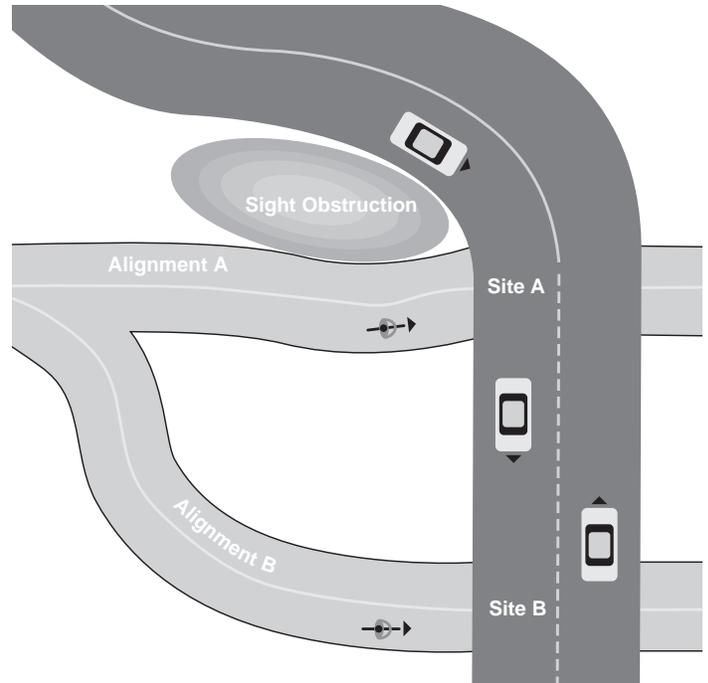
Proper path alignment can help eliminate sight obstructions. Alignment “B,” for example, gives a better crossing location than does alignment “A.”
